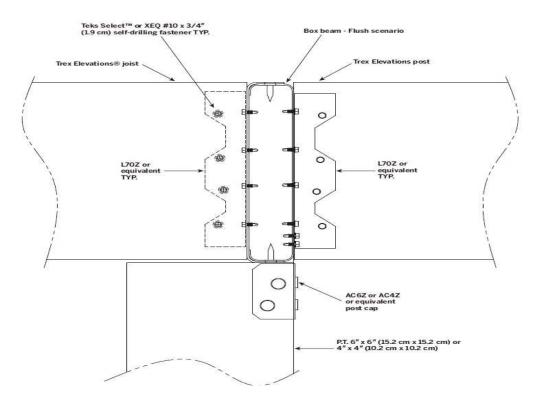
1-5/8 Joist to Box Beam Construction Detail – Sharing Flush Beam Scenario
